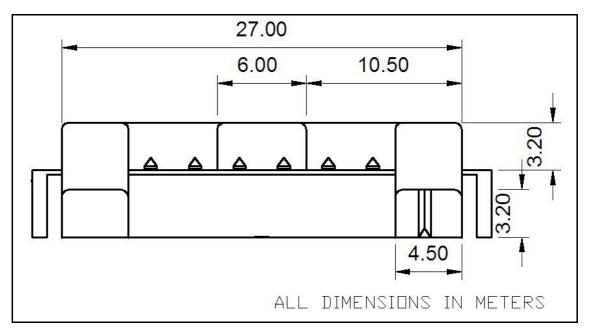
Front View Crossing Junction Switch Cover Dimensions
